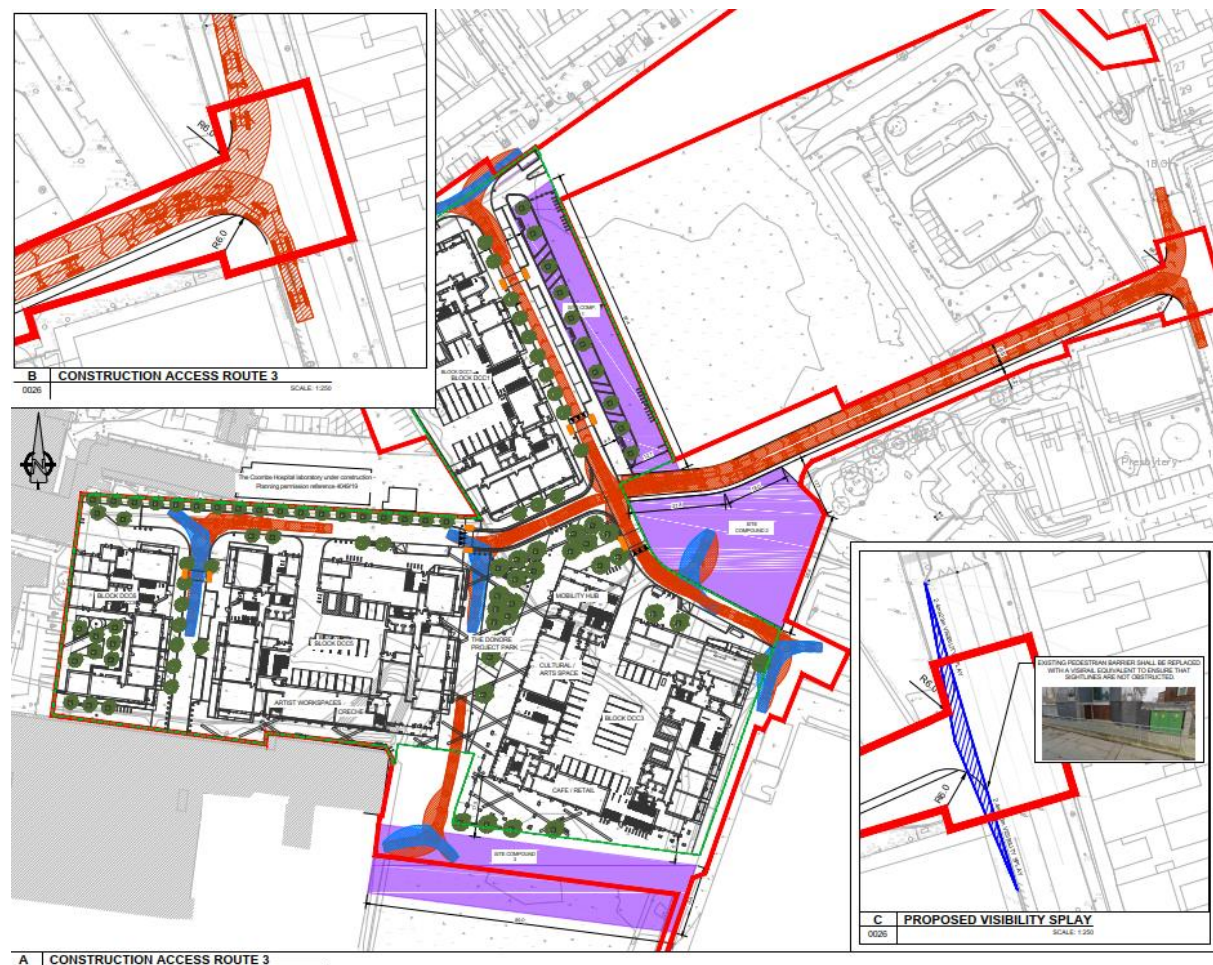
Construction Access Route (AECOM Drawing: STG-AEC-S1b-00-00-SK-C-0000026)
